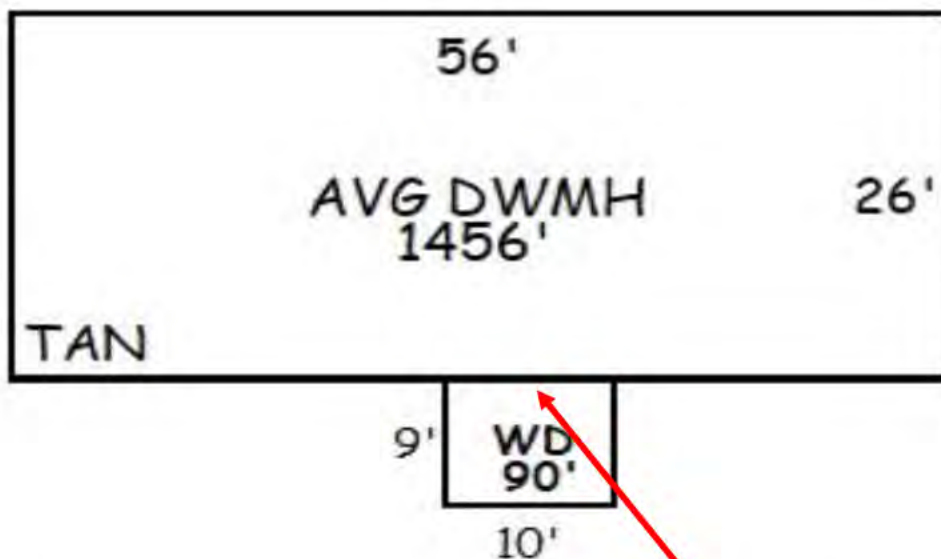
View of exterior dimensions with area of fire origin shown with red arrow
